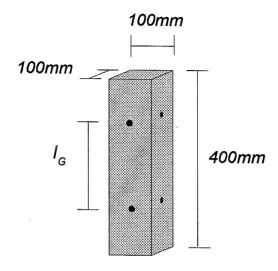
DEMEC: measuring points and dimensions of the test specimens.
